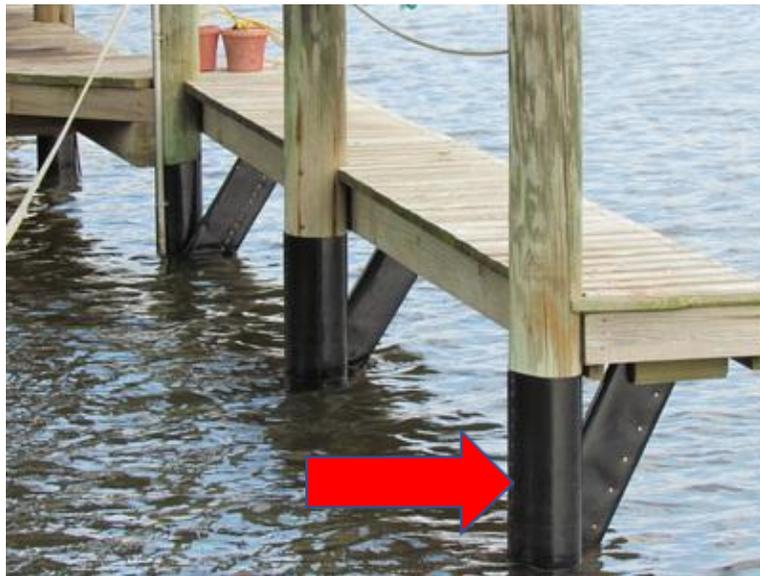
Heavy-duty pilings with piling protectors around them (*Dock Repair: Piling Repair | Louisiana, Mississippi, Florida, Alabama, Texas, n.d.*)
